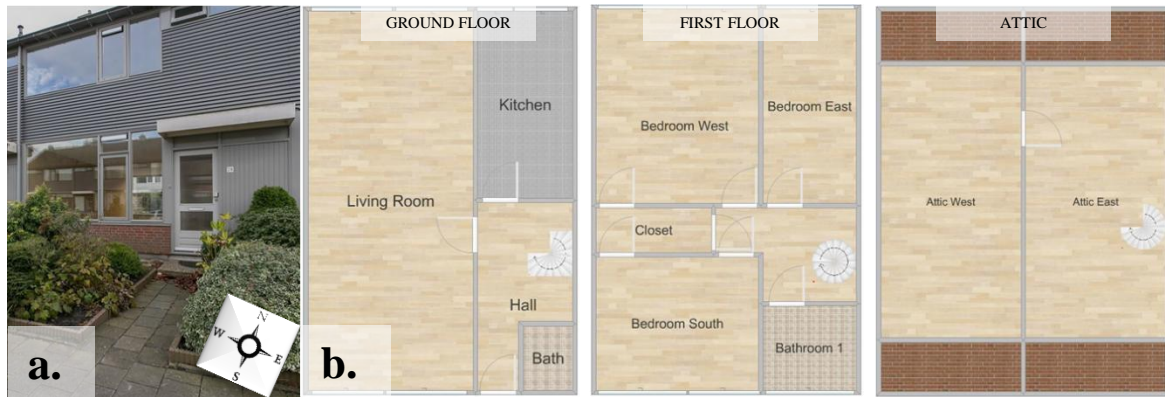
a. Townhouse building; b. Floor plan of the apartment in the townhouse building showing the ground floor, first floor, and attic.
